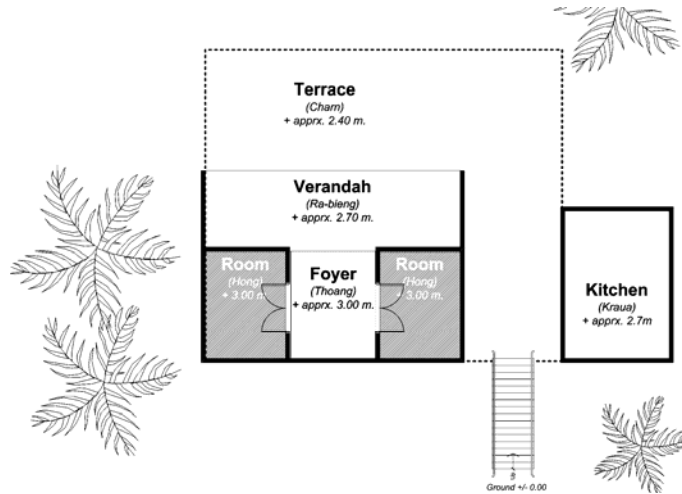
Diagram of a typical floor plan layout for a single dwelling
